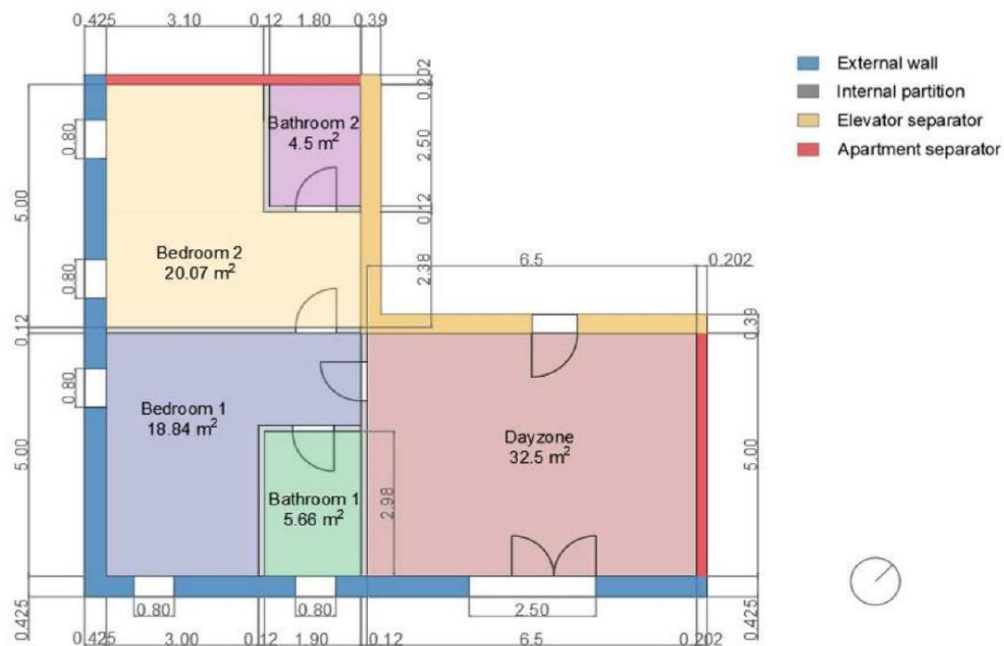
Apartment plan, areas of the rooms and adjacency information.
